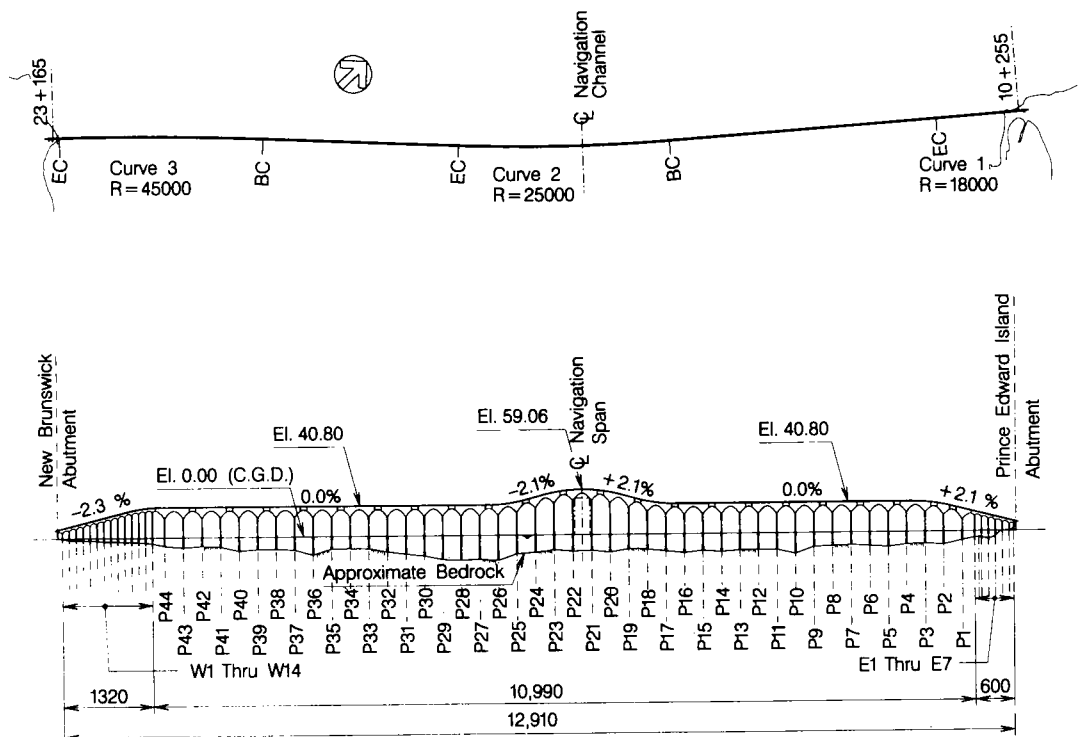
Bridge profile: top, plan; bottom, elevation.
